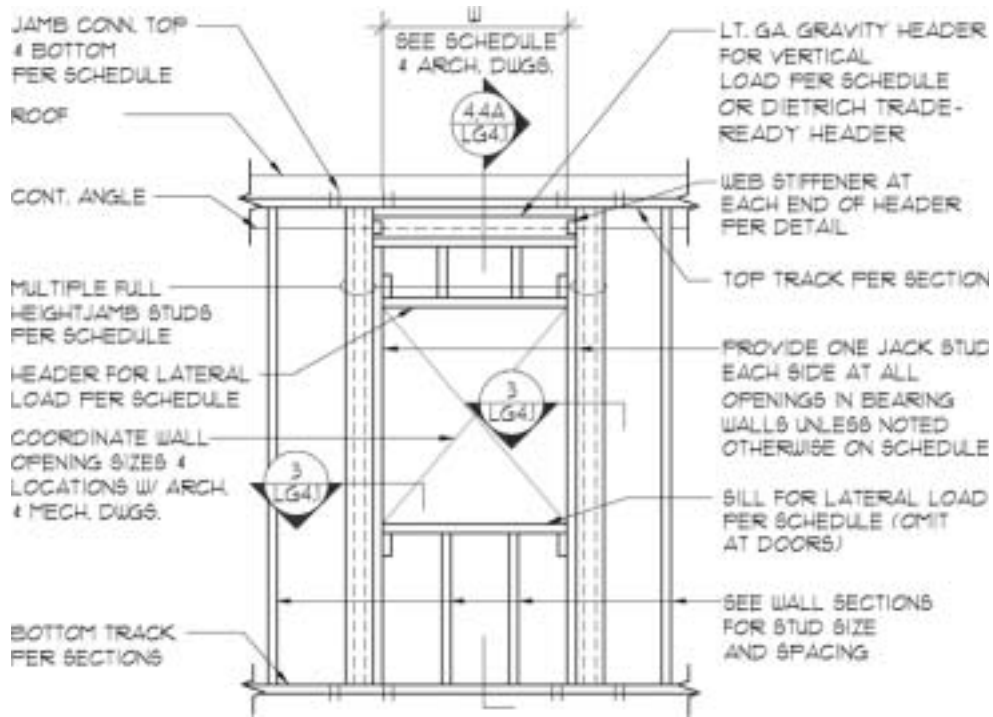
Typical exterior light-gage bearing stud elevation at opening
